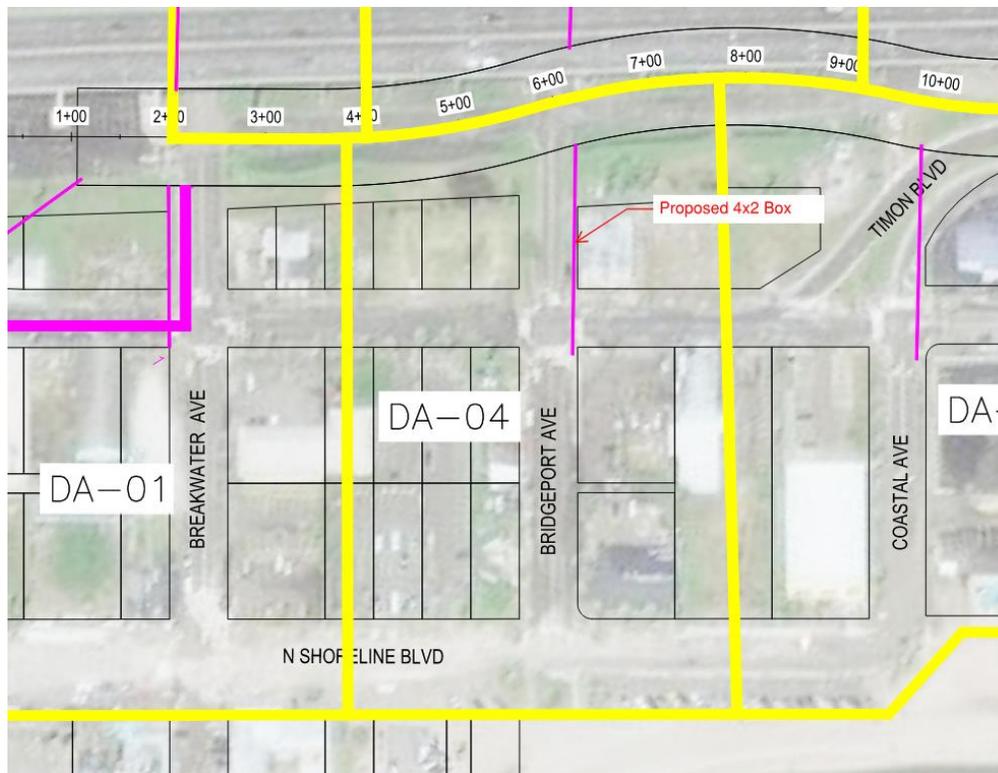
Snapshot of DA-04 – connection to Navigable Canal
